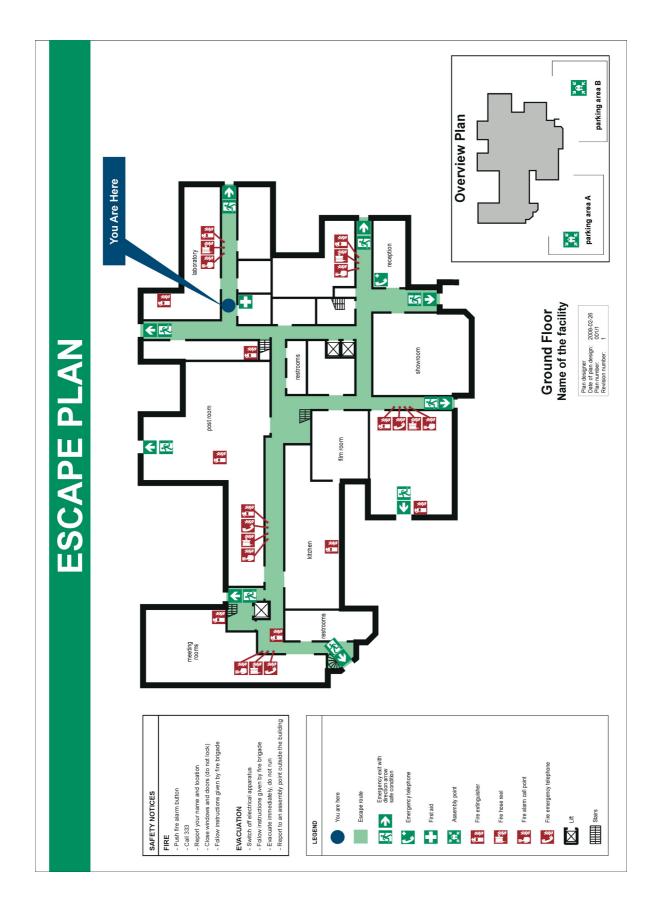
Example of an escape plan without directional arrows — Complete floor
